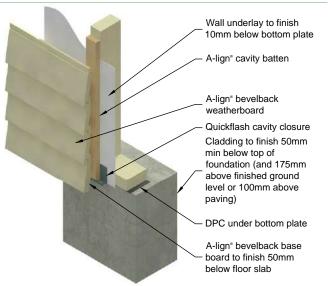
Cavity fixed – base of wall – concrete floor – base board
